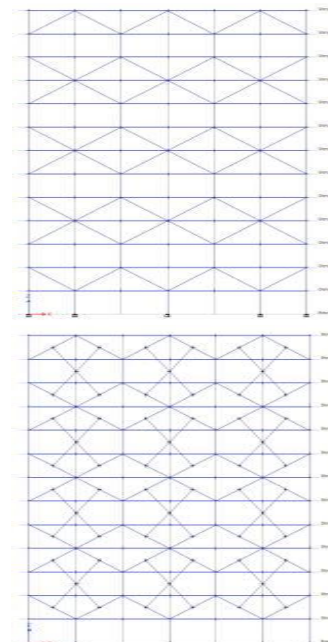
Elevation of Hexa, Fig-2: Elevation of Penta
